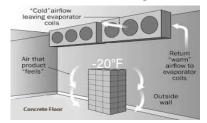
Typical Cold Storage Facility Layout. Ground beneath the concrete floor has the potential to freeze.
